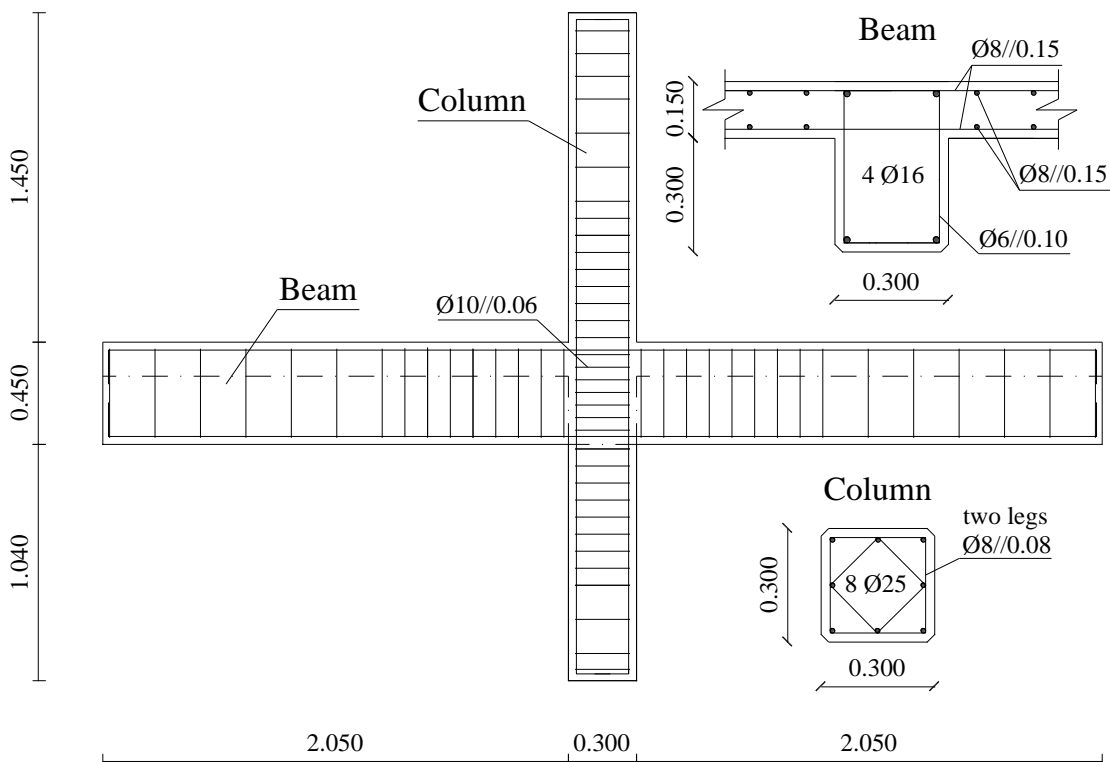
Full-scale beam-column joint specimen C-EC8 reinforcement detailing (in m).
